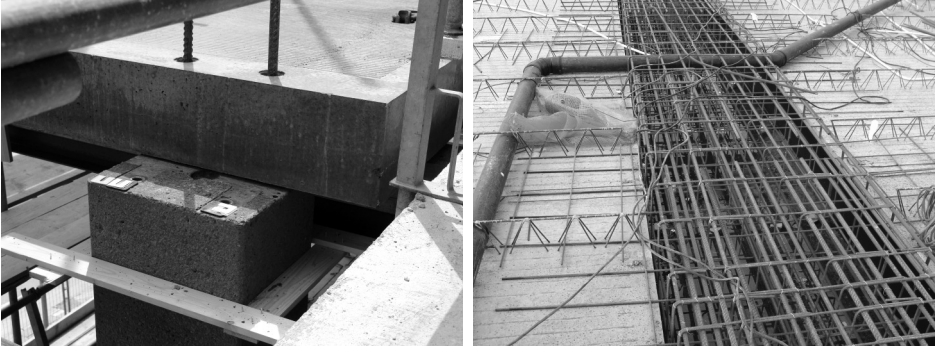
Left: Connection of a prefab floor to a column. The reinforcement of both elements are not in contact with each other. Right: A floor of which the upper part will be poured on-site. All reinforcement seen in this picture will be connected together additionally by meshes, rods and iron wire.
